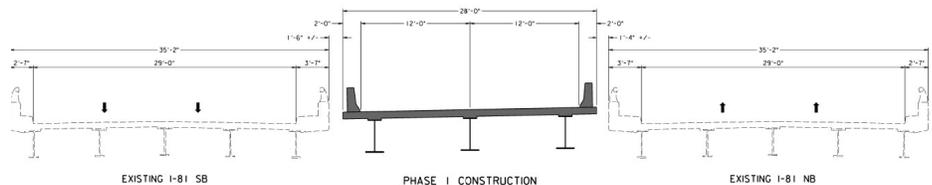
(1): Phase 1 Construction Utilizing Existing Bridges without Modification
